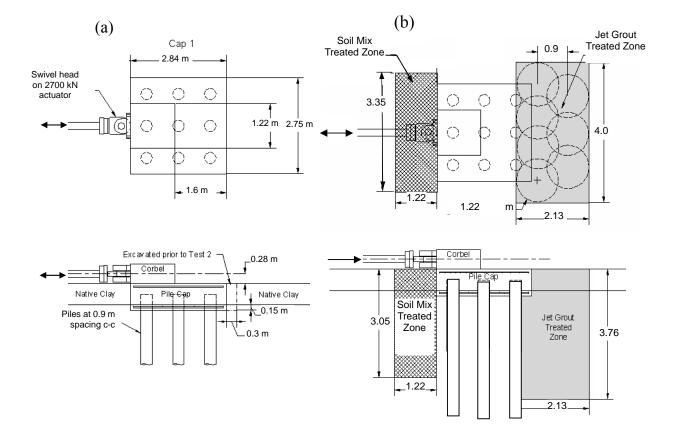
Plan and profile drawings of the pile group (a) in virgin clay before treatment and (b) after jet grout treatment.
